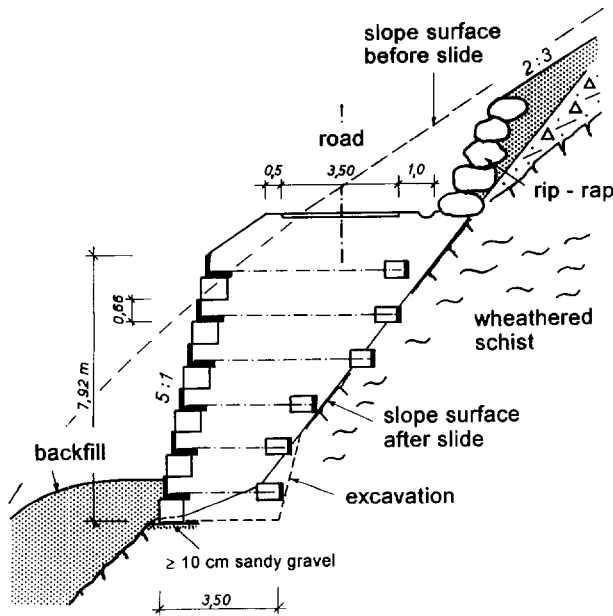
Loop anchored wall to reconstruct a road in a steep slope after landslide had occurred.
